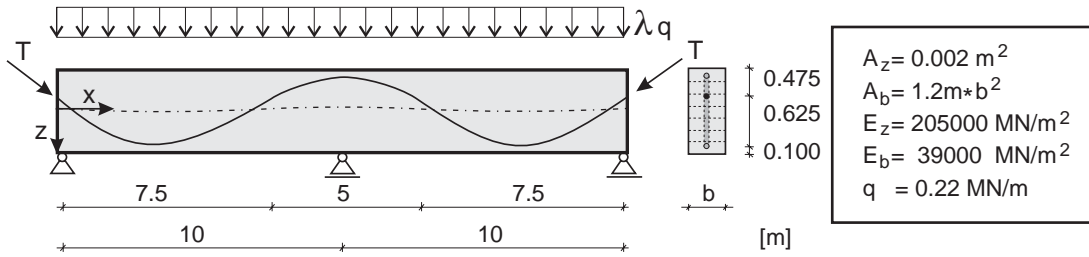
Prestressed two-bay-beam with rectangular cross-section
